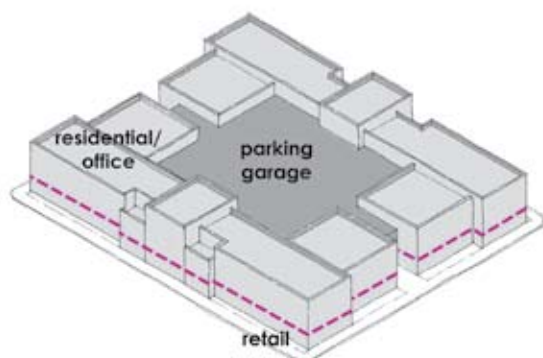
An illustration of a project that incorporates a parking garage within the site design
